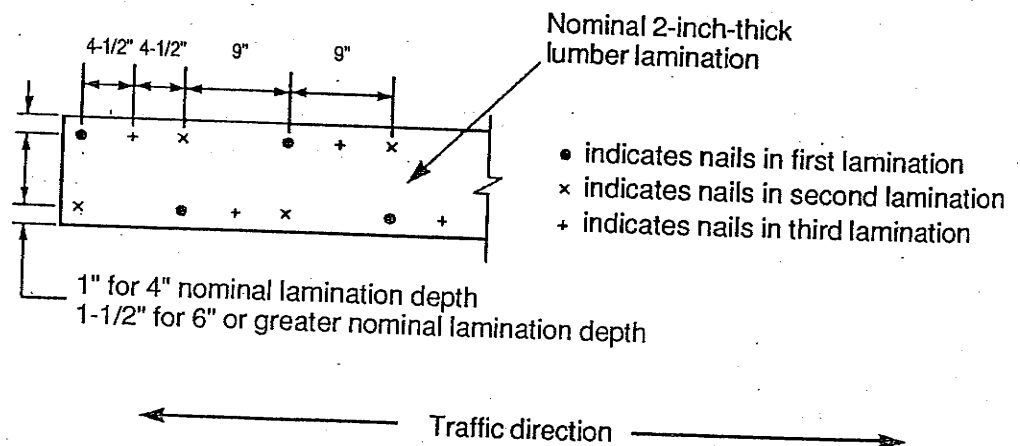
Nailing pattern for continuous longitudinal nail-laminated lumber decks constructed of nominal 2-inch-thick sawn lumber.
